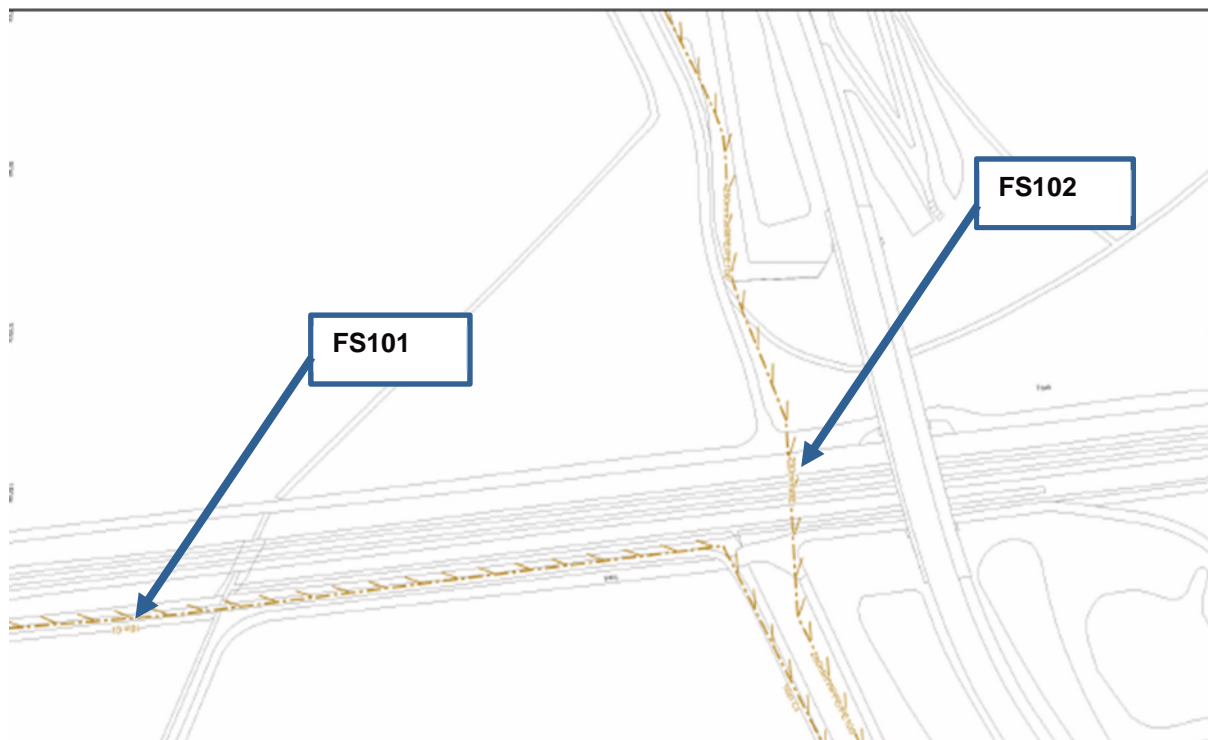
BT Telecoms north side of BGK-1544a Long Road
